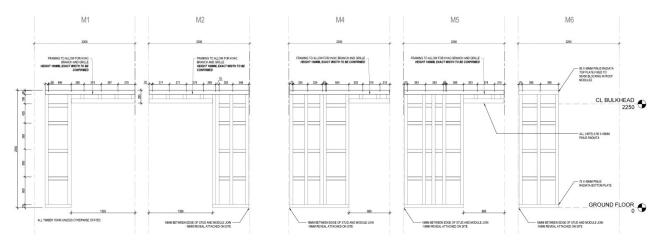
The services core wall framing, showing the bathroom and laundry door openings spanning the module join
